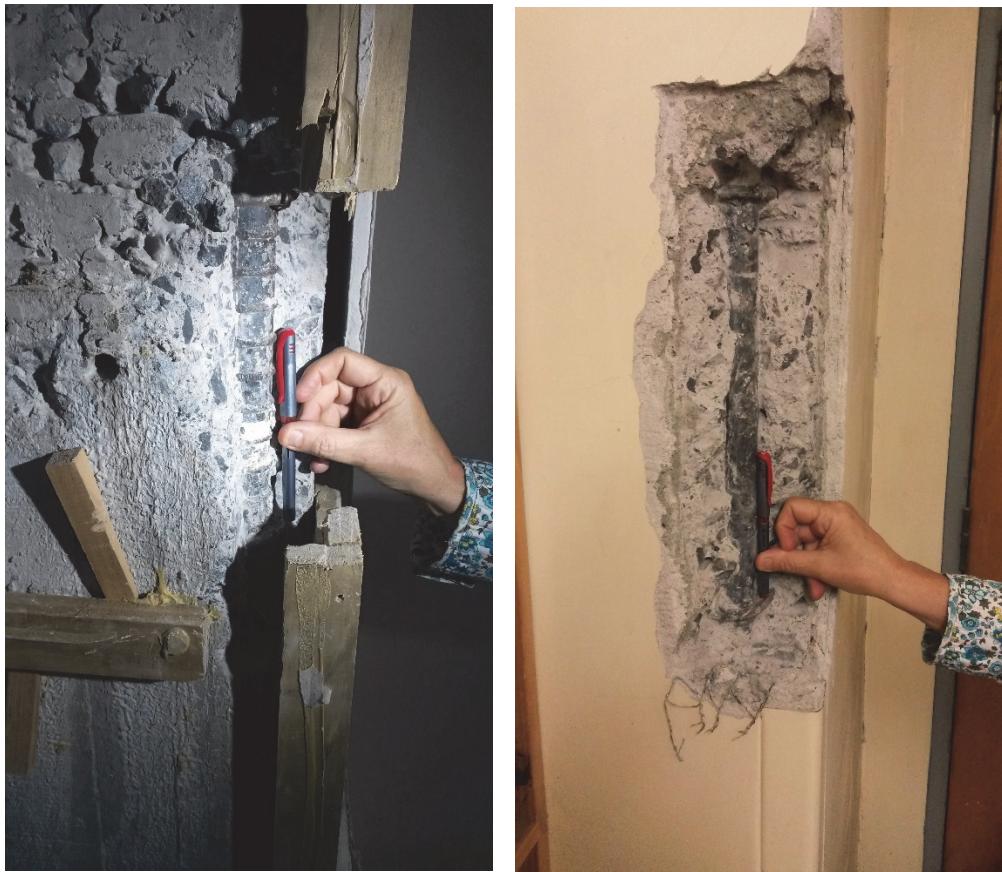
Deformed bar used in half of the building, and round bar being used in the other half.
